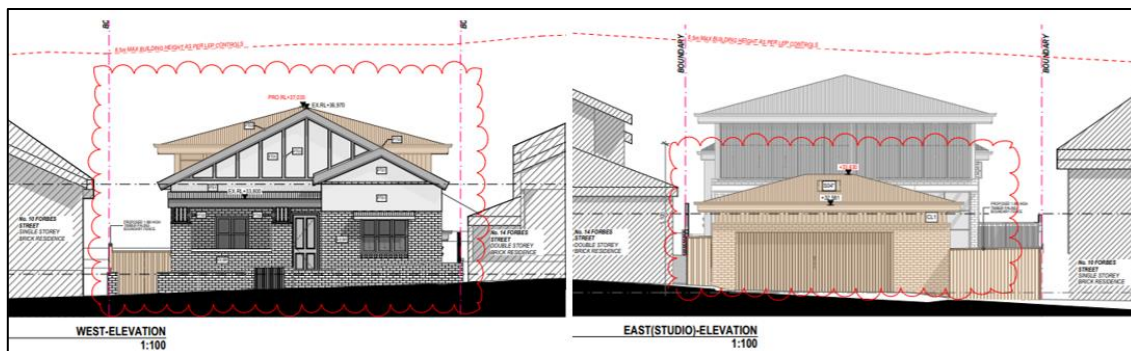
Amended Plans - Revision E (subject of this report)
